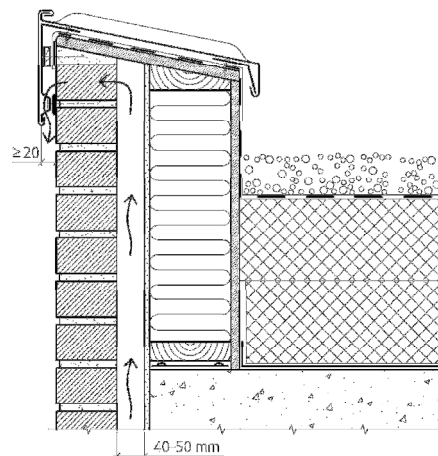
Construction principal of a brick wall with a larger ventilated opening behind the bricks and with openings on the top. The gap behind the bricks should be large enough to prevent it from being closed by mortar.
